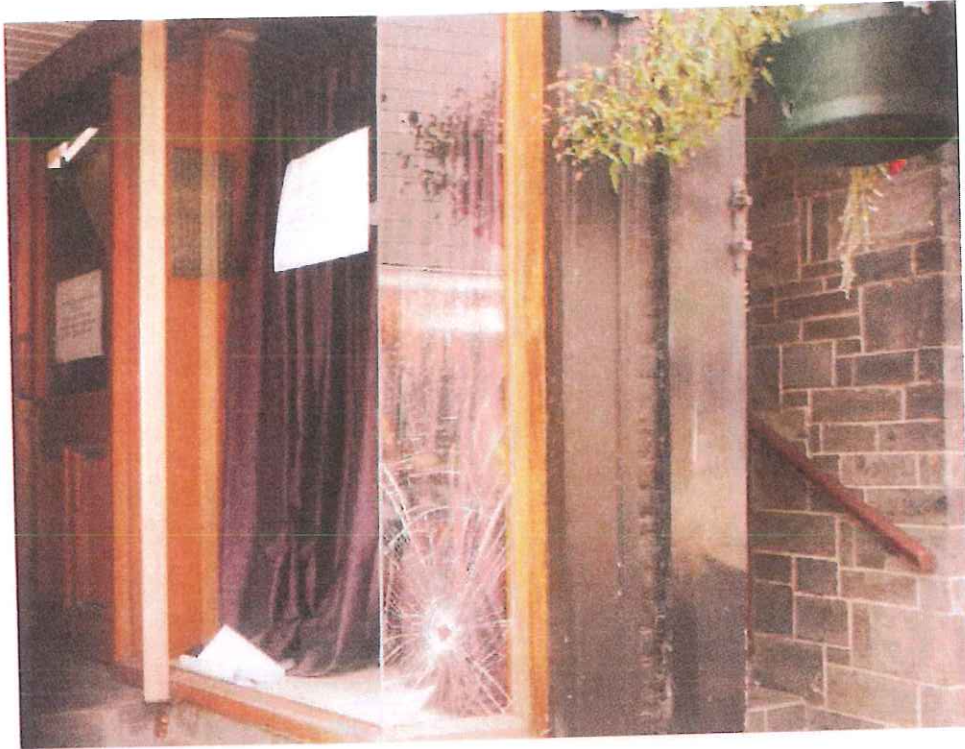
; Damage to window of 5 West Street (taken 24/08/17)
